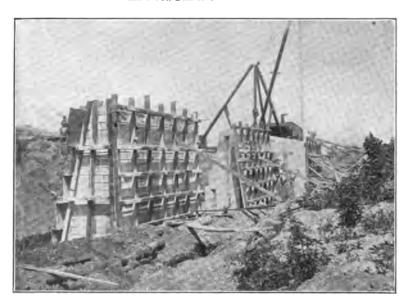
GUIDE WALL AT FORT PLAIN.
